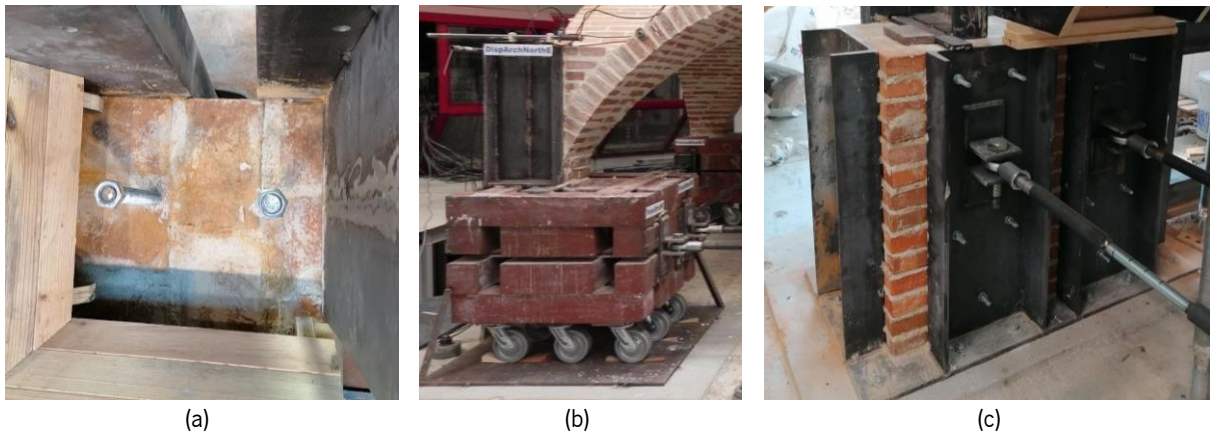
Boundary conditions details: (a) steel connectors inside the fixed piers, (b) wheels above the steel surface and anchored to the ground before the tests, (c) steel cables with rod ends and load cells in place.
